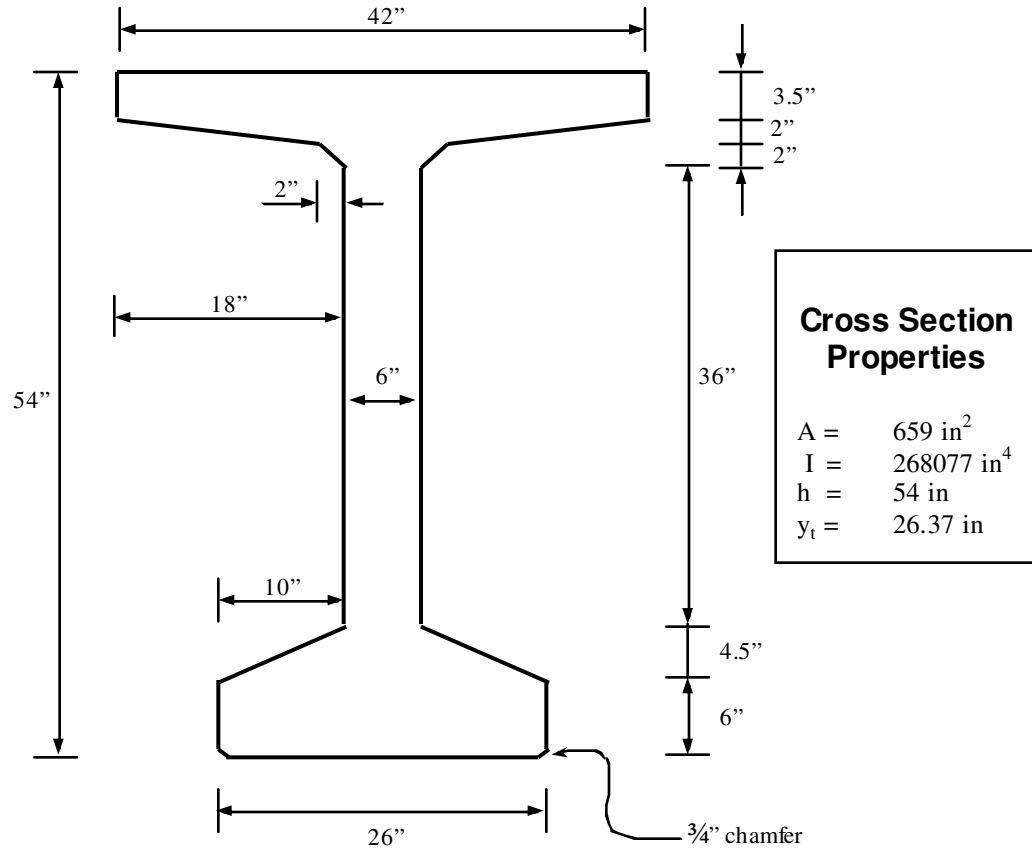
Cross Section of a Typical BT54 Girder (Swenson 2003a)
